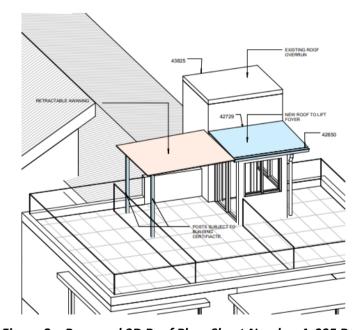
Proposed 3D Roof Plan, Sheet Number A-005 Rev B
